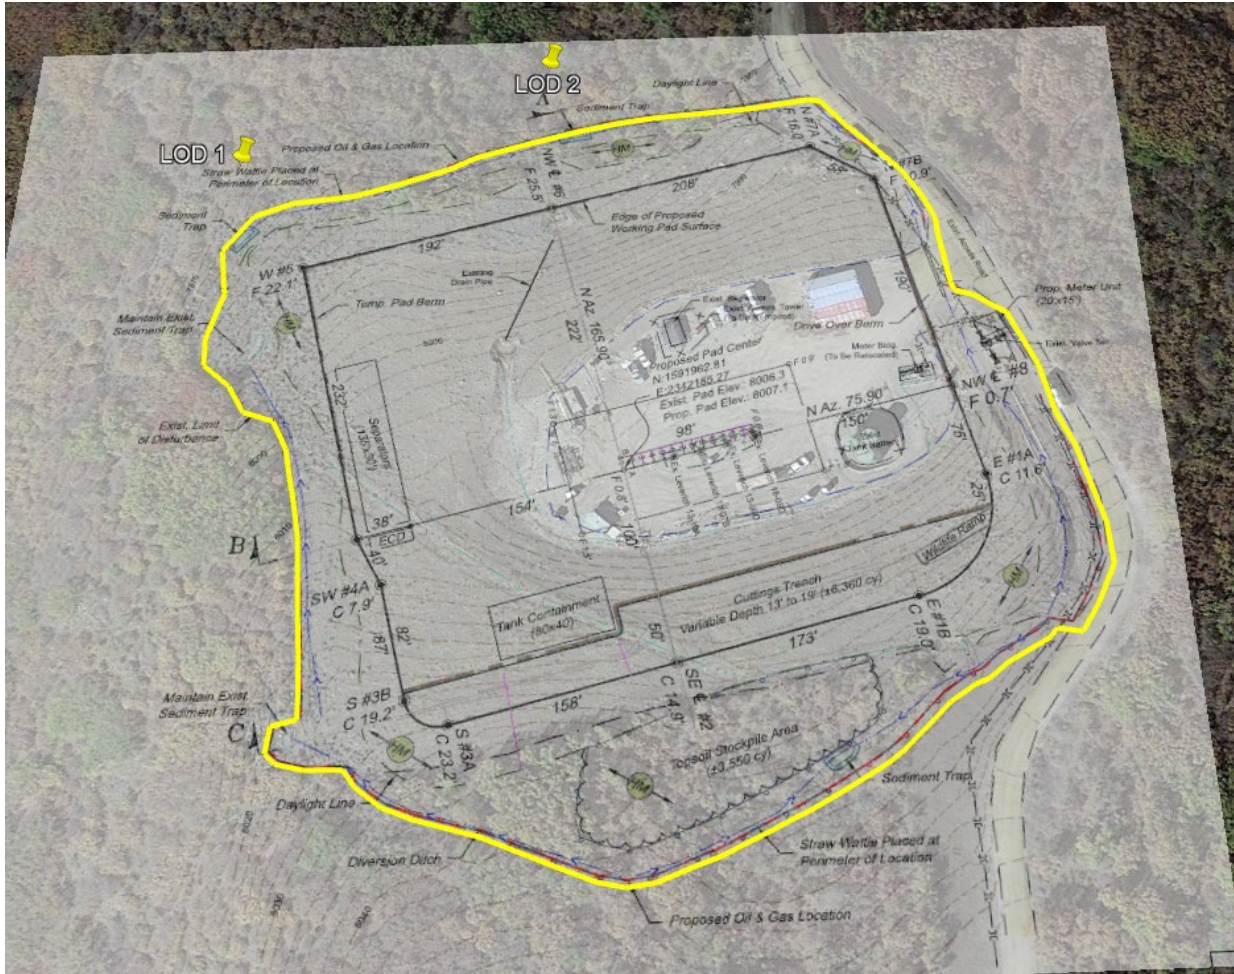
Photo shows the construction layout drawing overlaid on Google Earth imagery with the 2A location (yellow). “LOD” pins show GPS points of the actual location disturbance which extend approximately 70 feet beyond the permitted location.
